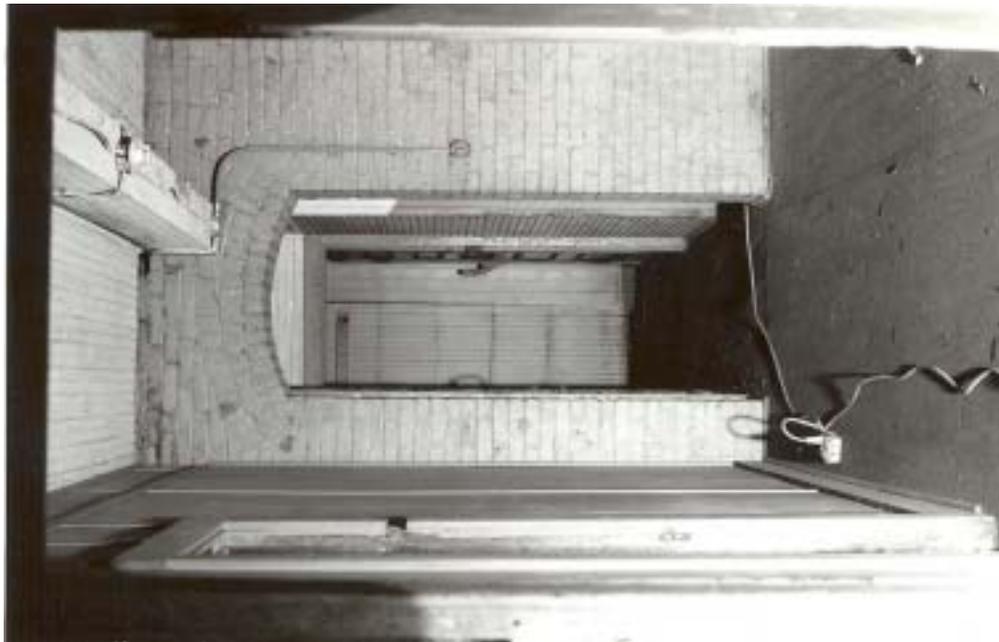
View south from Room 201, through doorway D-22 into Room 203, and beyond to doorway D-28 in fire wall [1993].
